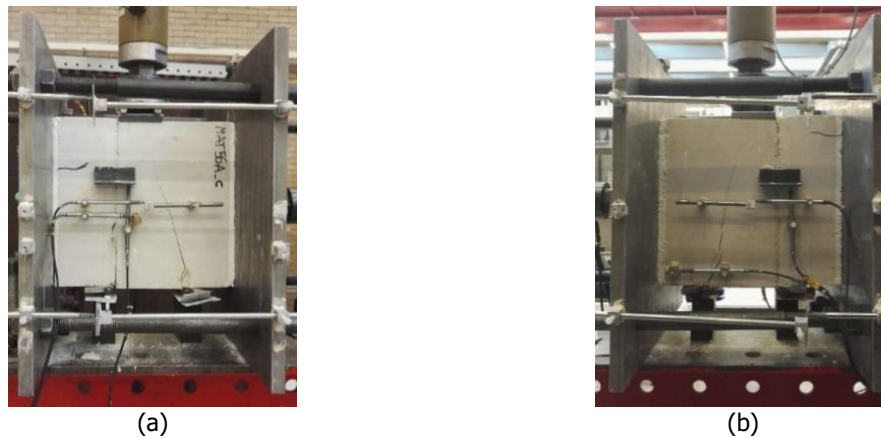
Developing horizontal crack in the unit (specimen TUD_MAT-56A-c): (a) front side; (b) back side.
